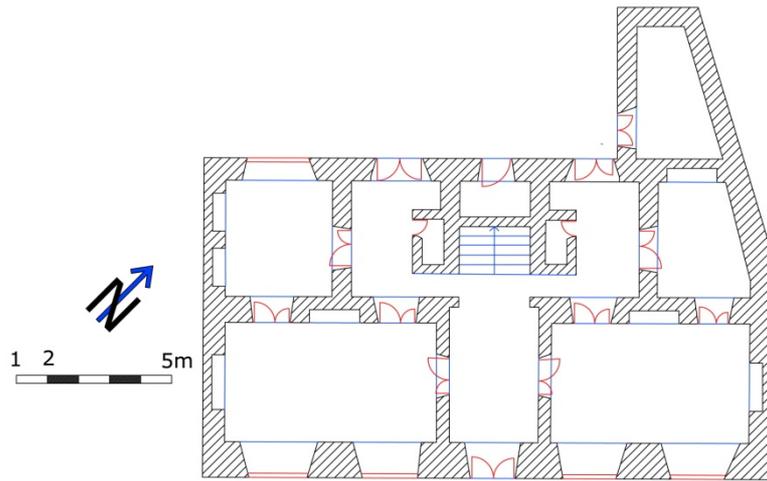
Ground floor plan, Source: Kasmaei 2005, p.82 (my drawings)
